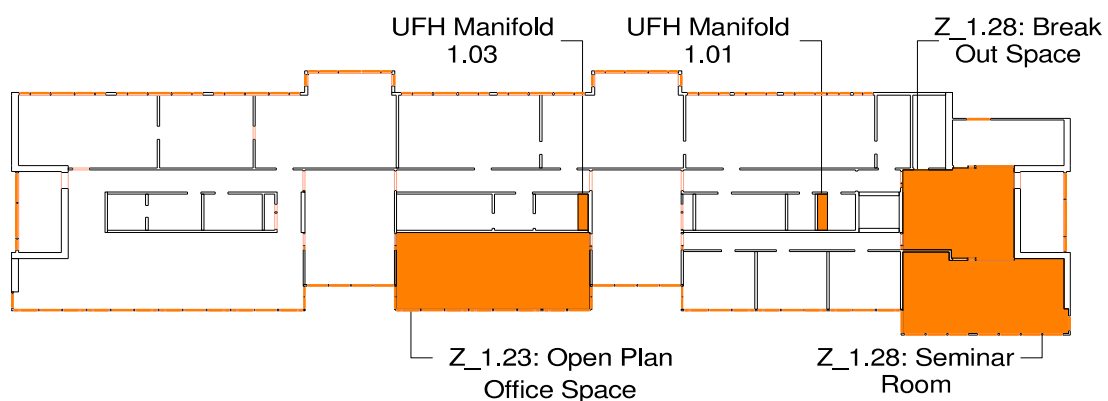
ERI Floor plan with demonstration room Z_1.23.
